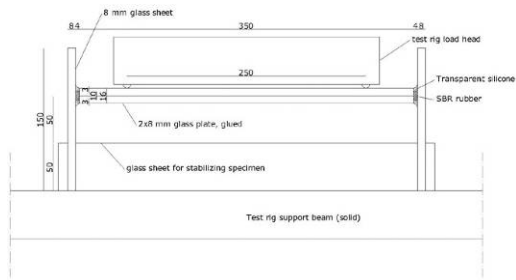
Specimen geometry for roof-to-façade joint testing.
